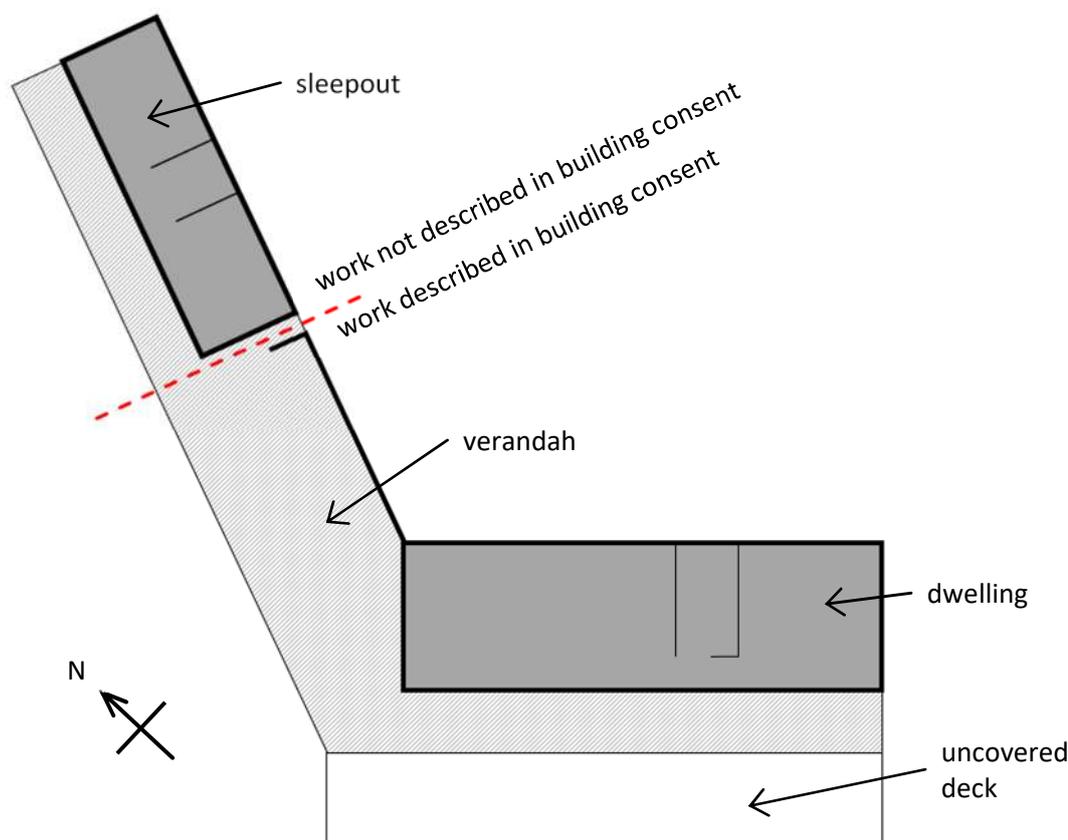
Floor plan diagram showing the dwelling and sleepout. Not to scale.
